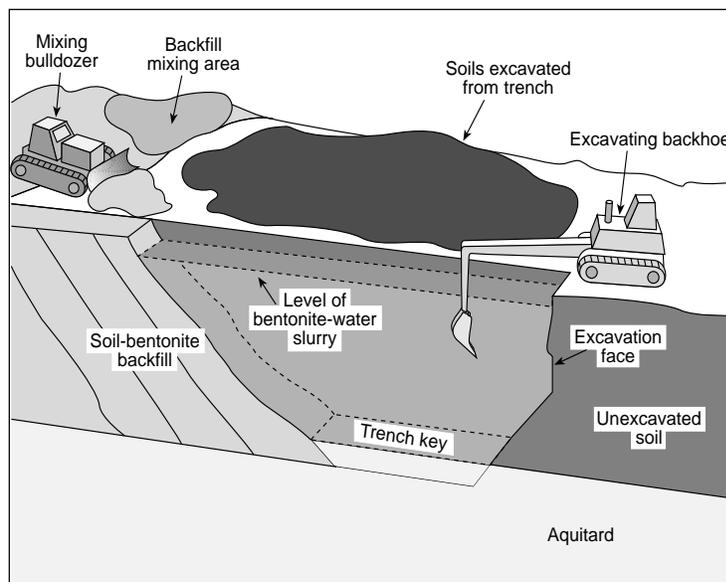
Soil-bentonite cutoff wall (Rumer and Ryan, 1995)
